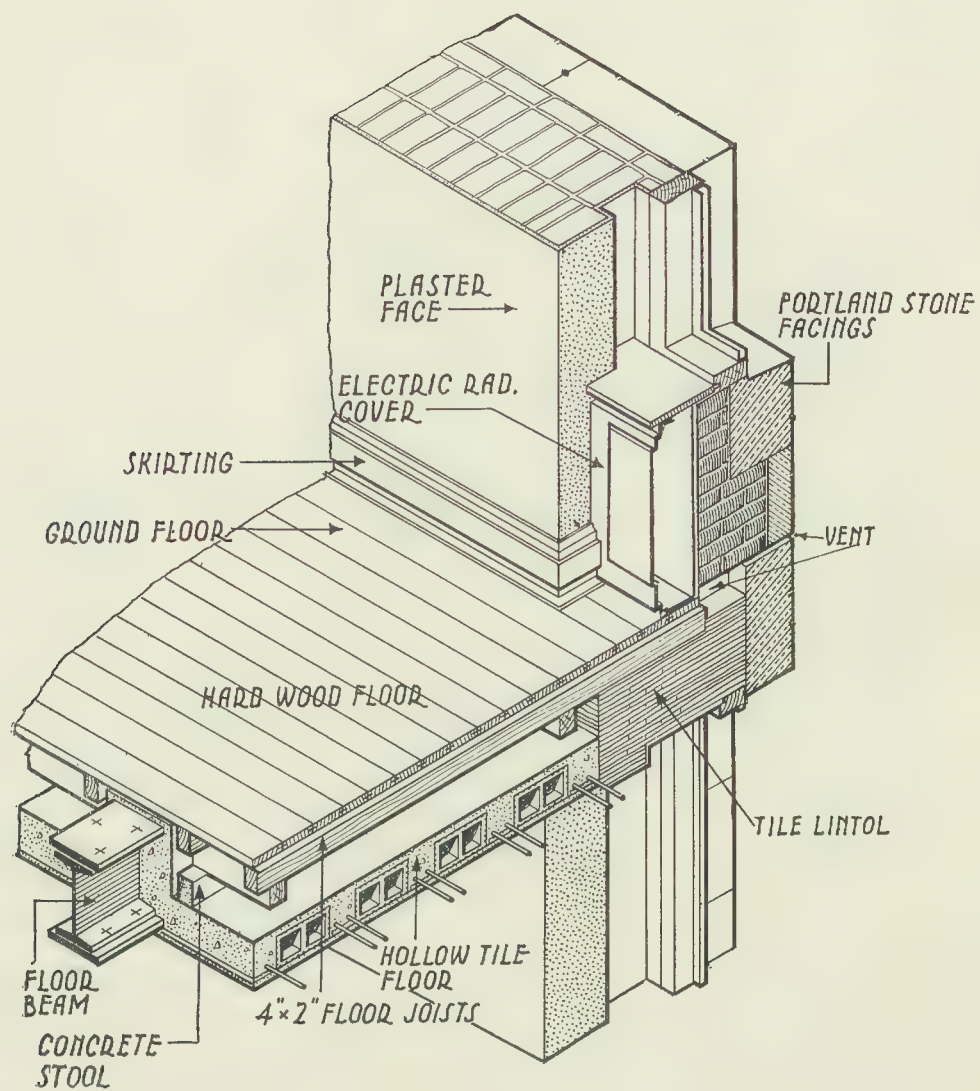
SOUND-PROOF HOLLOW BLOCK FLOOR
